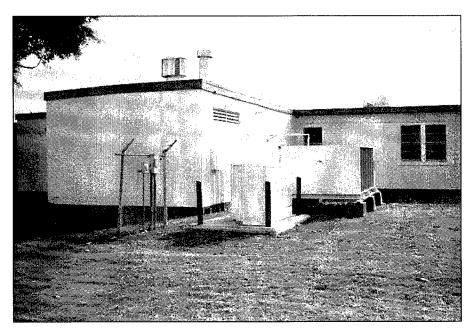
The boiler for Building 5088 is located in a connected, adjacent building.
